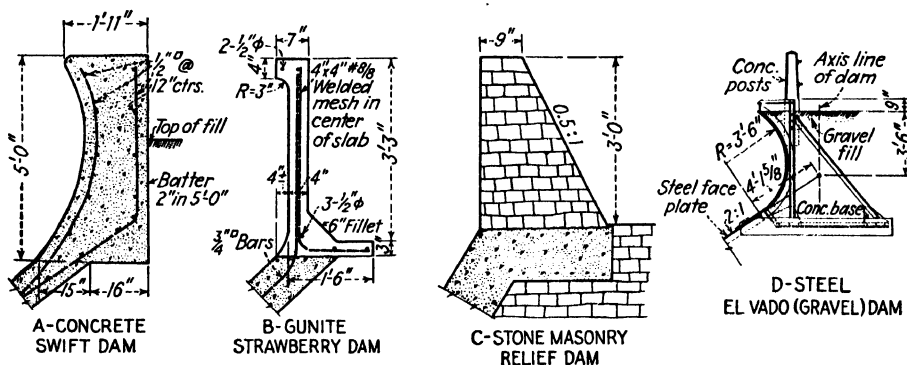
Typical sections of parapet wall and wave deflectors.
